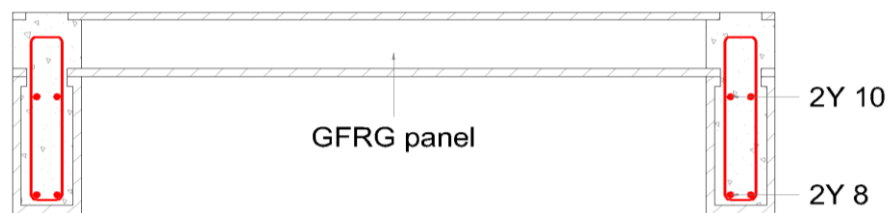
Reinforcement detail for integrating sunshade panels with GFRG vertical fin
